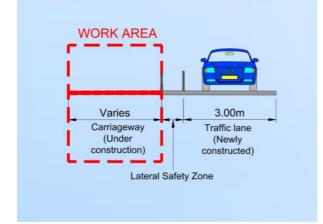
Traffic Management Cross Section, Section 2a - Stage 1b
